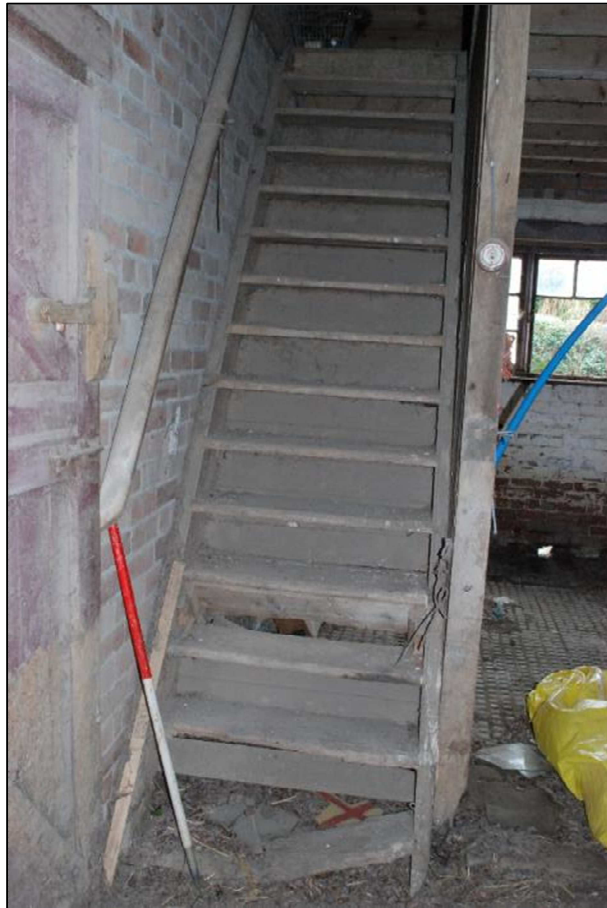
(Shot 48): Staircase at the eastern end of Building C, looking south
